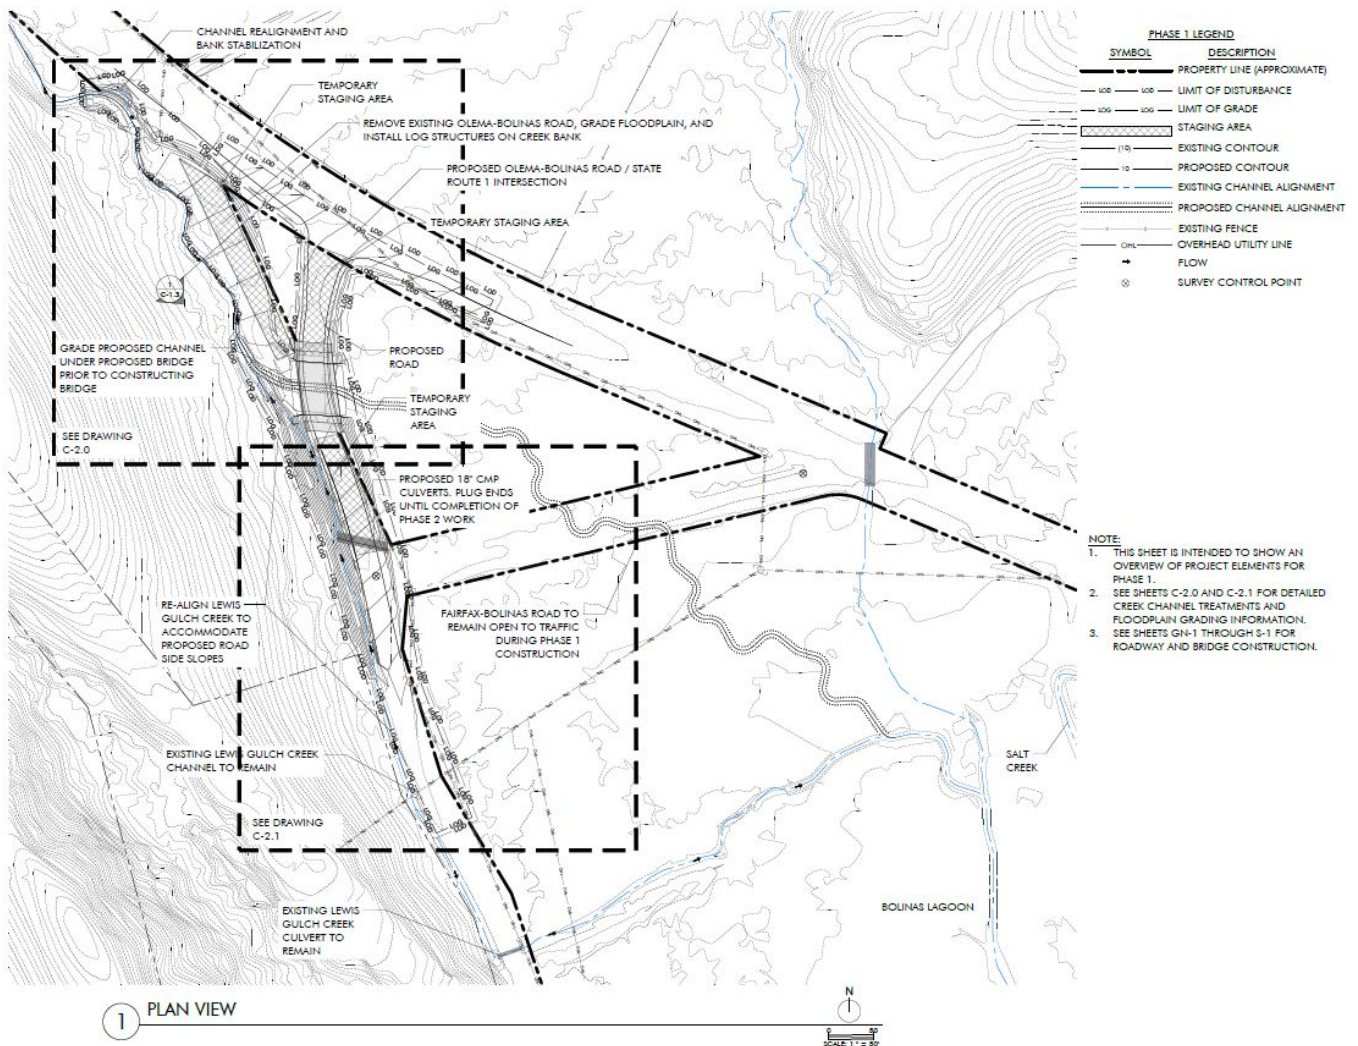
Bolinas Lagoon Wye, Year 1 Construction Elements, Sheet C-1.0
